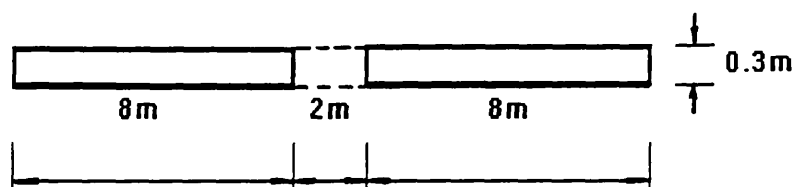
EXAMPLE STRUCTURE, PLAN DIMENSIONS
